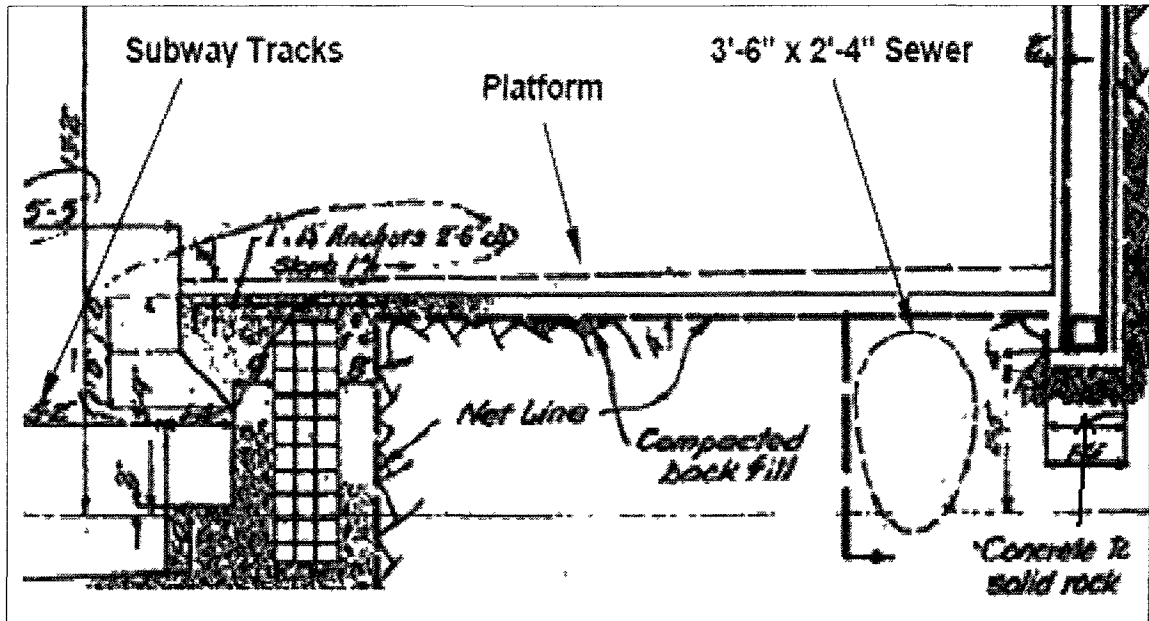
An Egg-shaped Sewer Located Underneath the Subway Platform at 7th Avenue Roadway (modified after Dino Ng, 2008)
